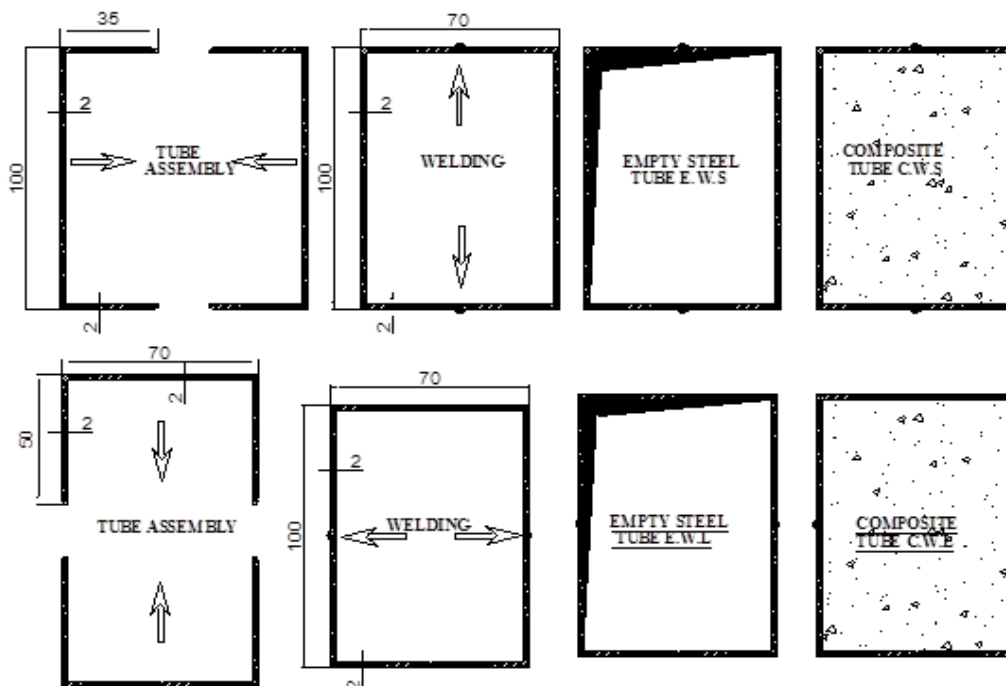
Tube manufacture cross section (Empty and filled).^[3]
